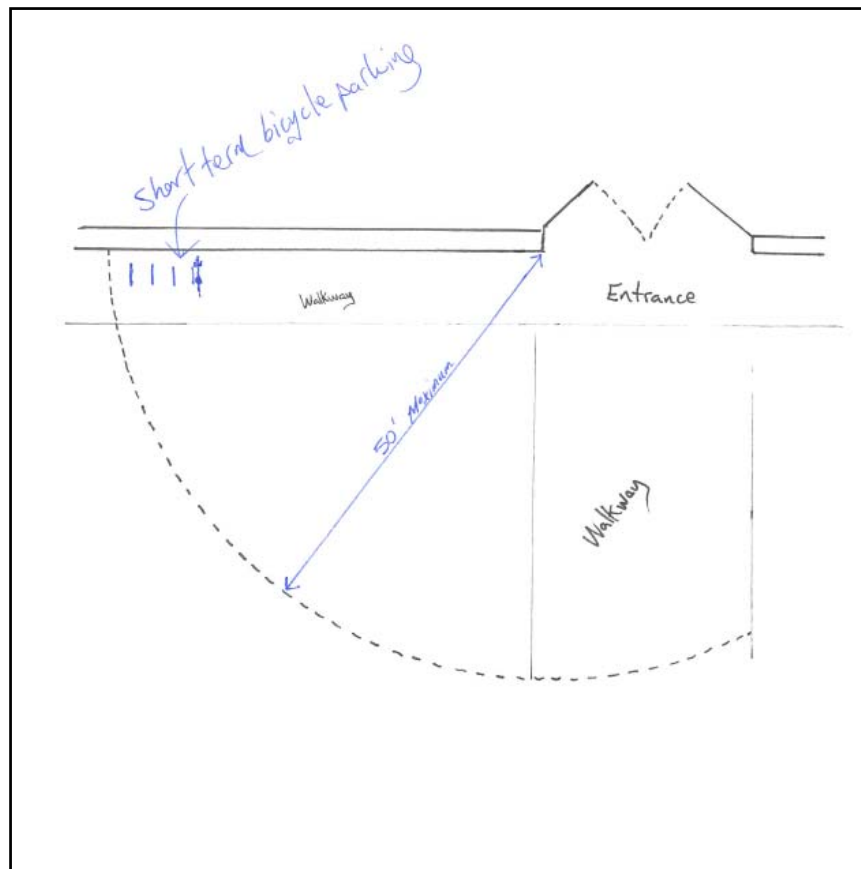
Short-term Bike Parking – One Building, Multiple Entrances
